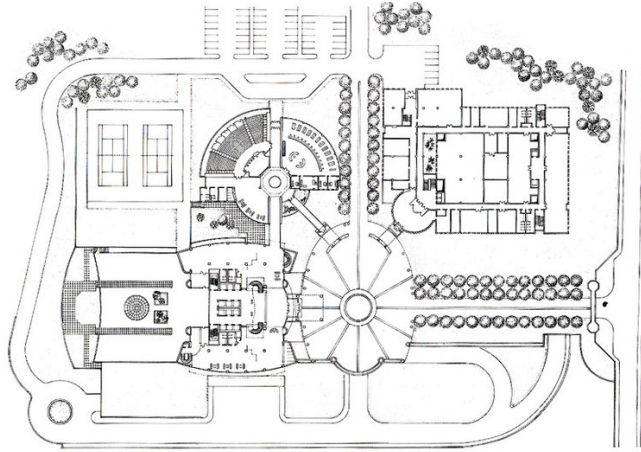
Entrance Floor Plan of Halkbank Headquarters
